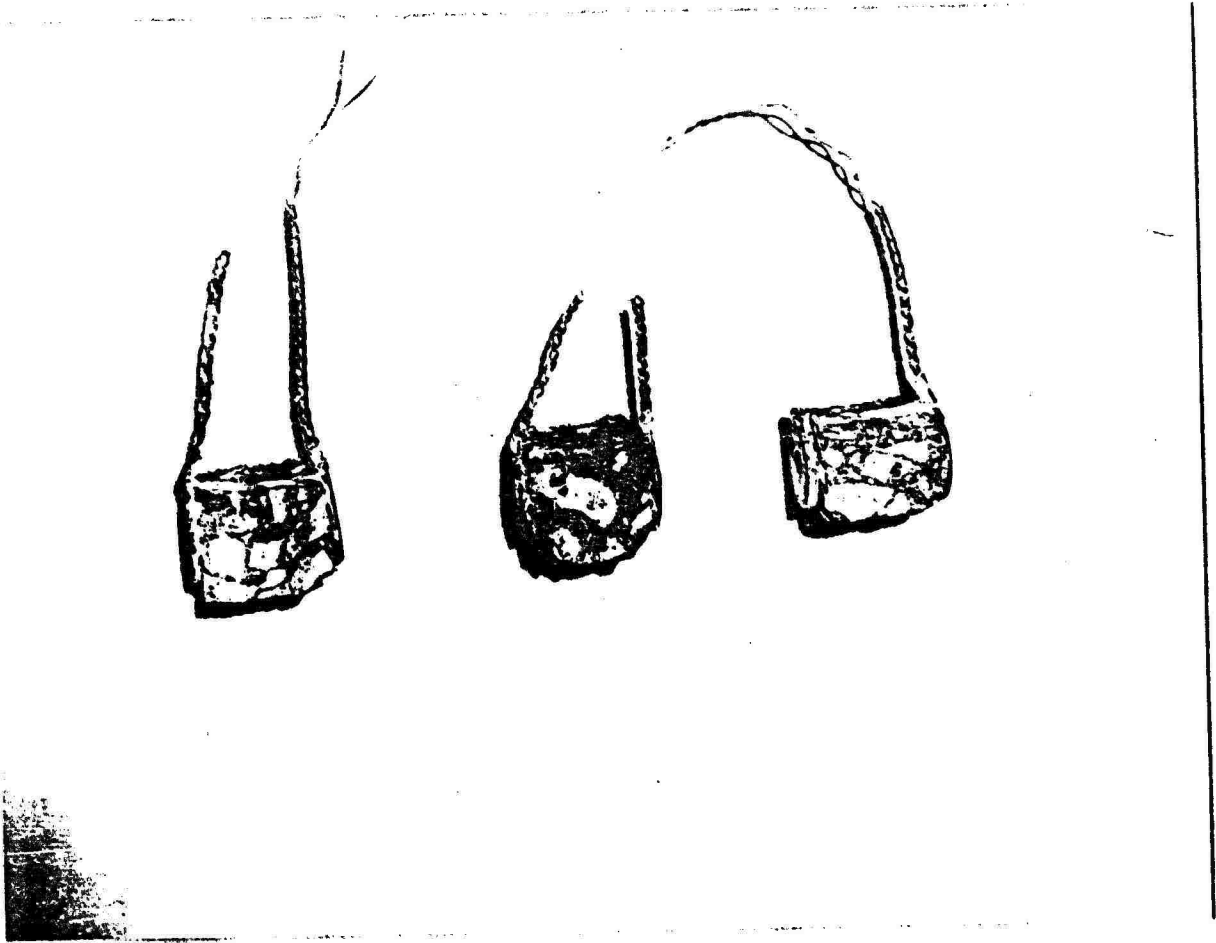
EXCAVATED CARRIER BLOCKS
